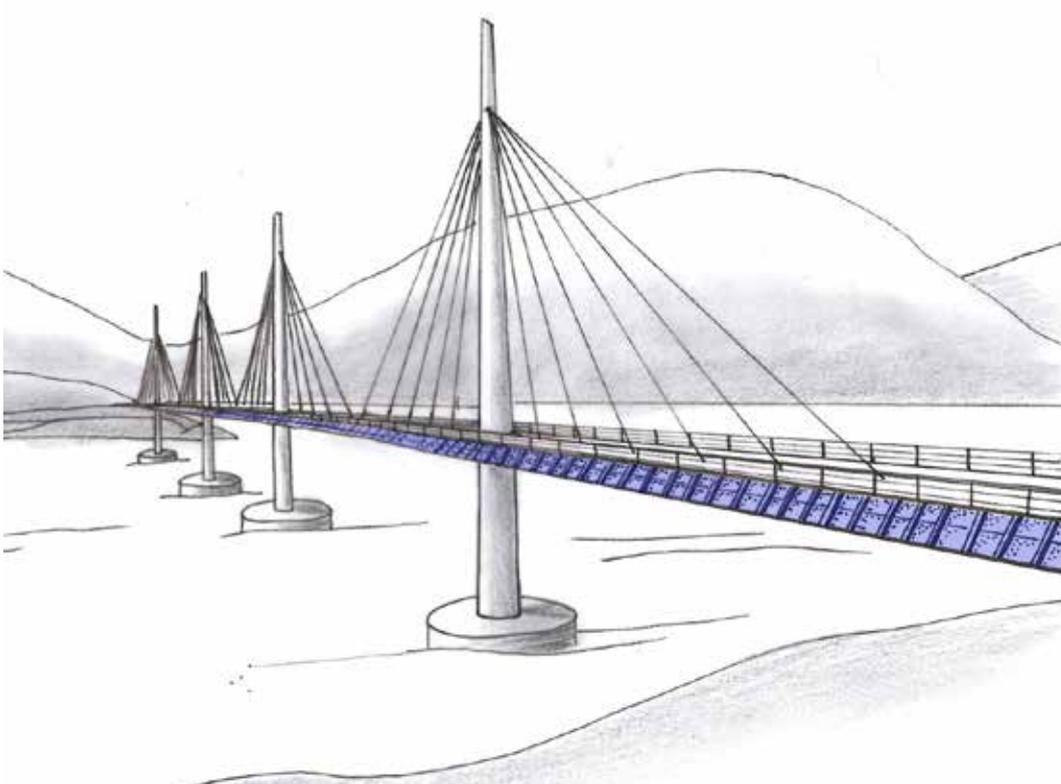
Panels mounted on the side of a suspension or floating bridge, Norconsult
